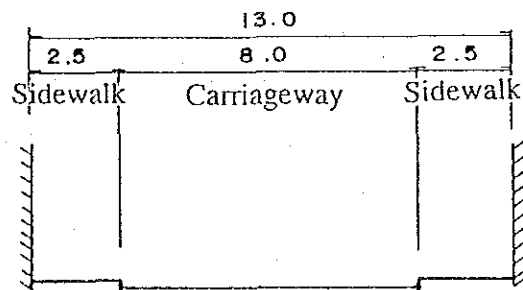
Typical Cross-Section of New Bagmati Bridge
